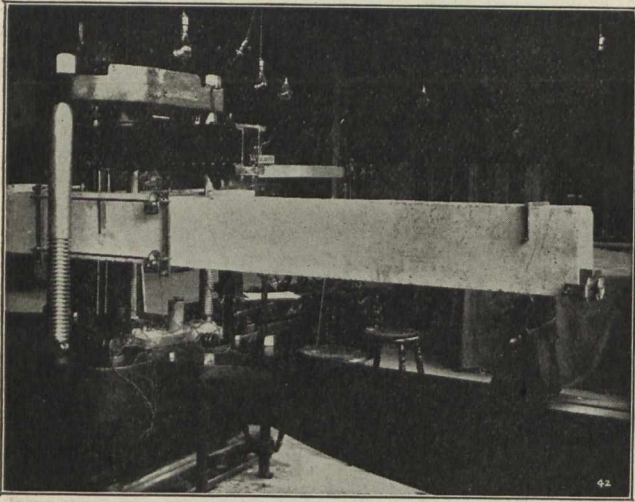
Testing a Thirteen-foot Concrete Beam.
